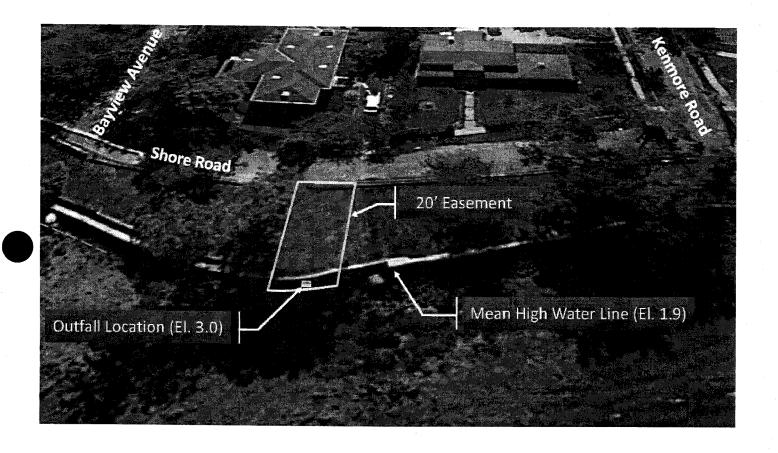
Outfall 2, Bayview Avenue to Kenmore Road
